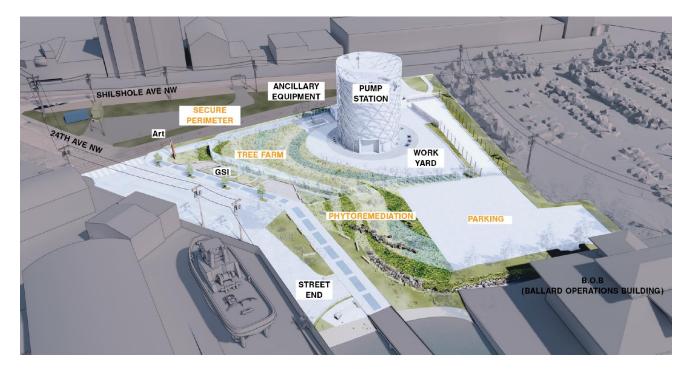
Aerial View of Conceptual Rendering of TEPS Facility and 24<sup>th</sup> Avenue NW Street End Improvements
